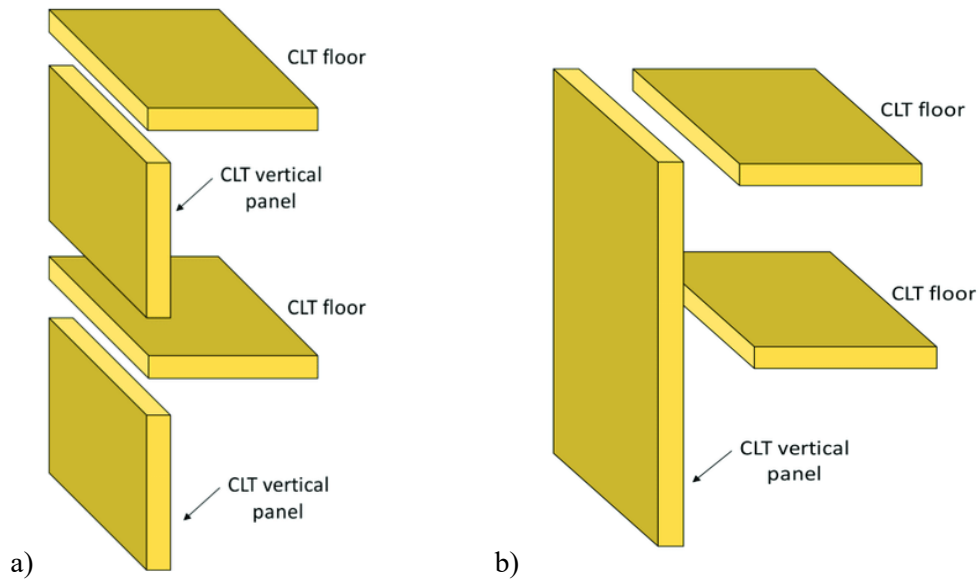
CLT construction: (a) platform-type; (b) balloon-type [32]
